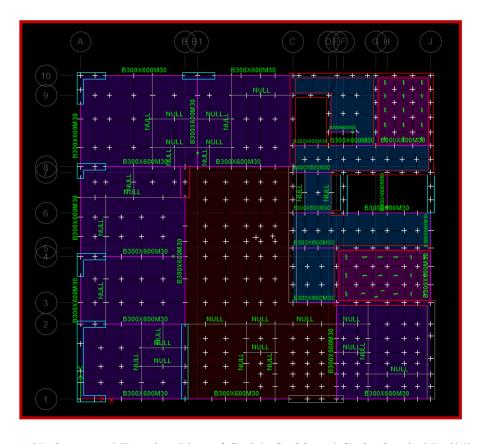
B Structural Framing Plan of G+24, G+30 and G+36 Storied Buildings
